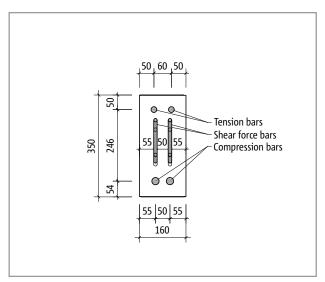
Schöck Isokorb® T type B-M1-V1 for R0: Product layout
